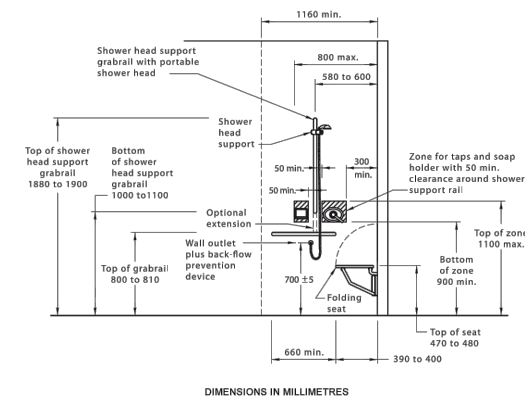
SHOWER RECESS FITTINGS—ELEVATION
